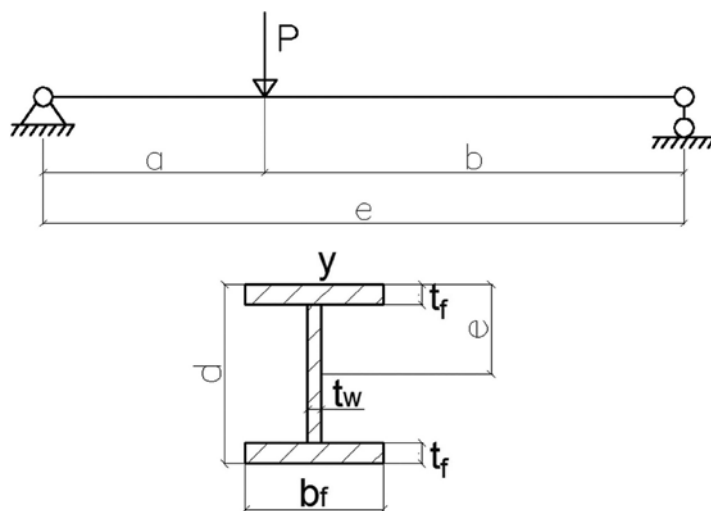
Calculation of a single-span beam for bending: a- girder geometry, b- cross-section.
